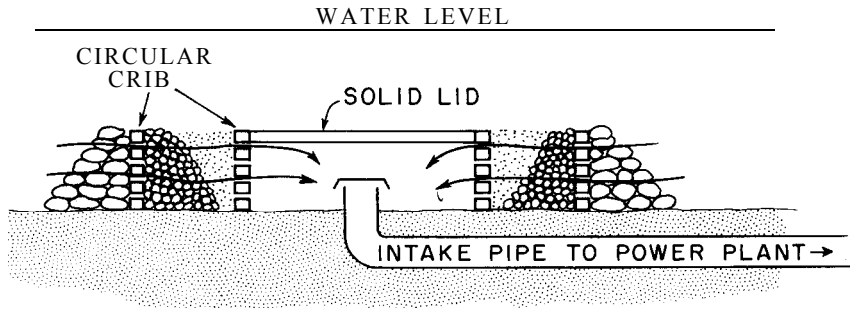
Design of a water intake crib which would avoid problems of fish entrapment and impingement.
